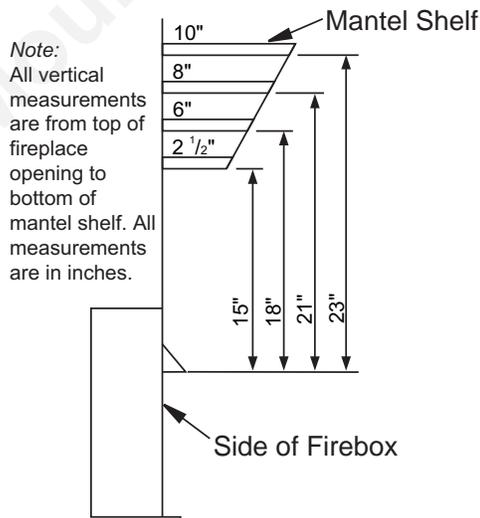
Minimum Mantel Clearances for Built-In Installation
